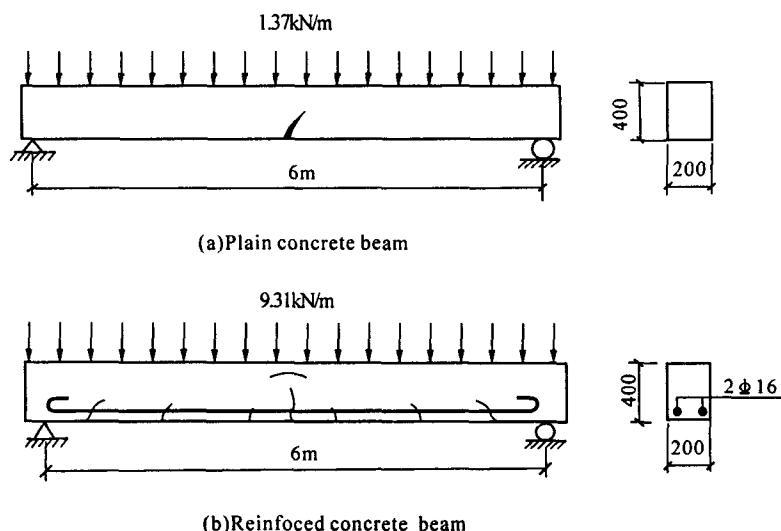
Plain concrete beam and reinforced concrete beam
